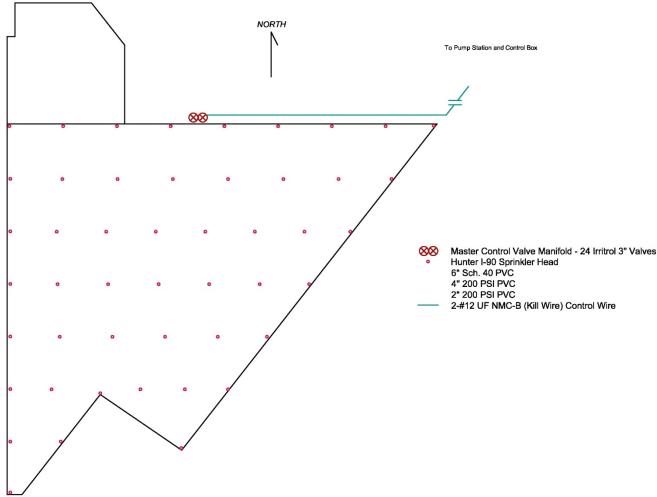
Bushland fetch control valve, sprinkler head, and control wire layout.
